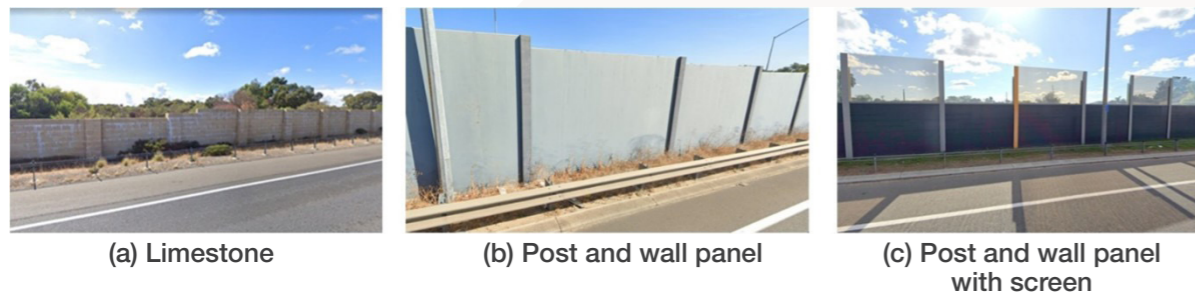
The Three Types of Roadside Wall Structures in the Case Study
